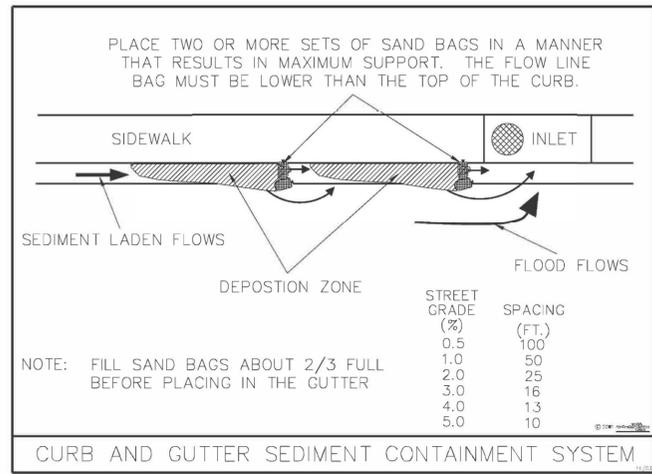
Illustration of a Curb and Gutter Sediment Containment System
